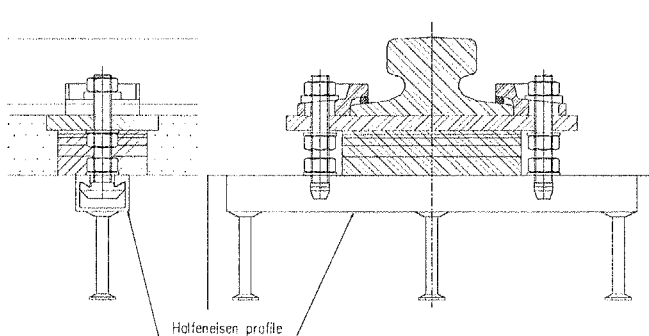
Halfeneisen profiles used to permit transverse adjustment of crane rails caused by convergence of the powerhouse walls
